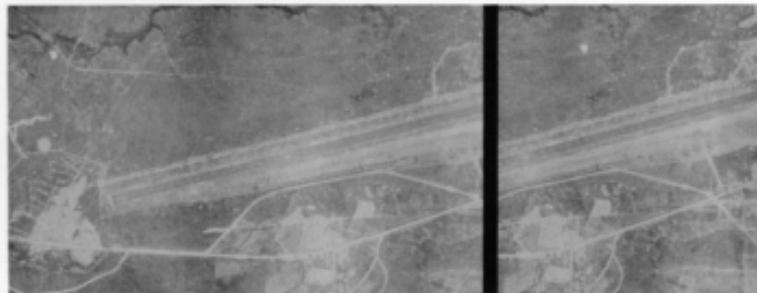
Pierced steel plank runway. At regular intervals sections of steel plank-
